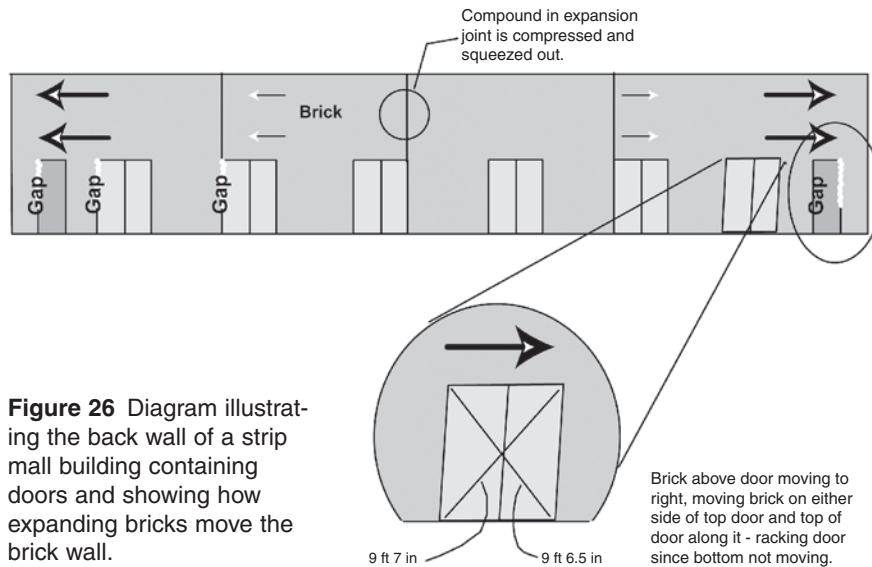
Diagram illustrating the back wall of a strip mall building containing doors and showing how expanding bricks move the brick wall.
